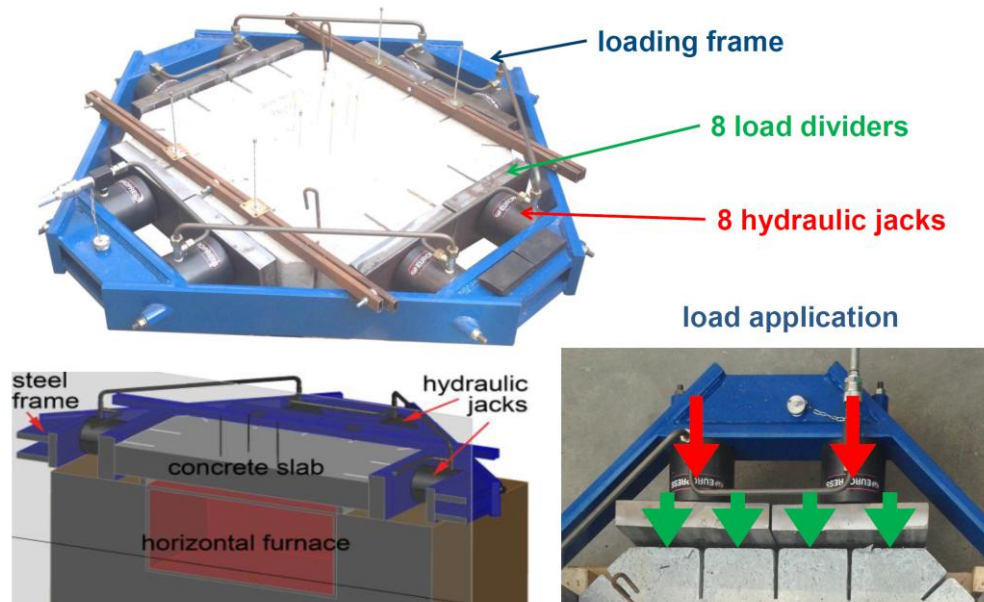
Spalling test performed on concrete slabs subjected to Standard Fire at the intrados under biaxial membrane loading. Heat is applied via a horizontal furnace with a propane burner, while biaxial load is obtained by means of a welded steel frame restraining 8 hydraulic jacks.
